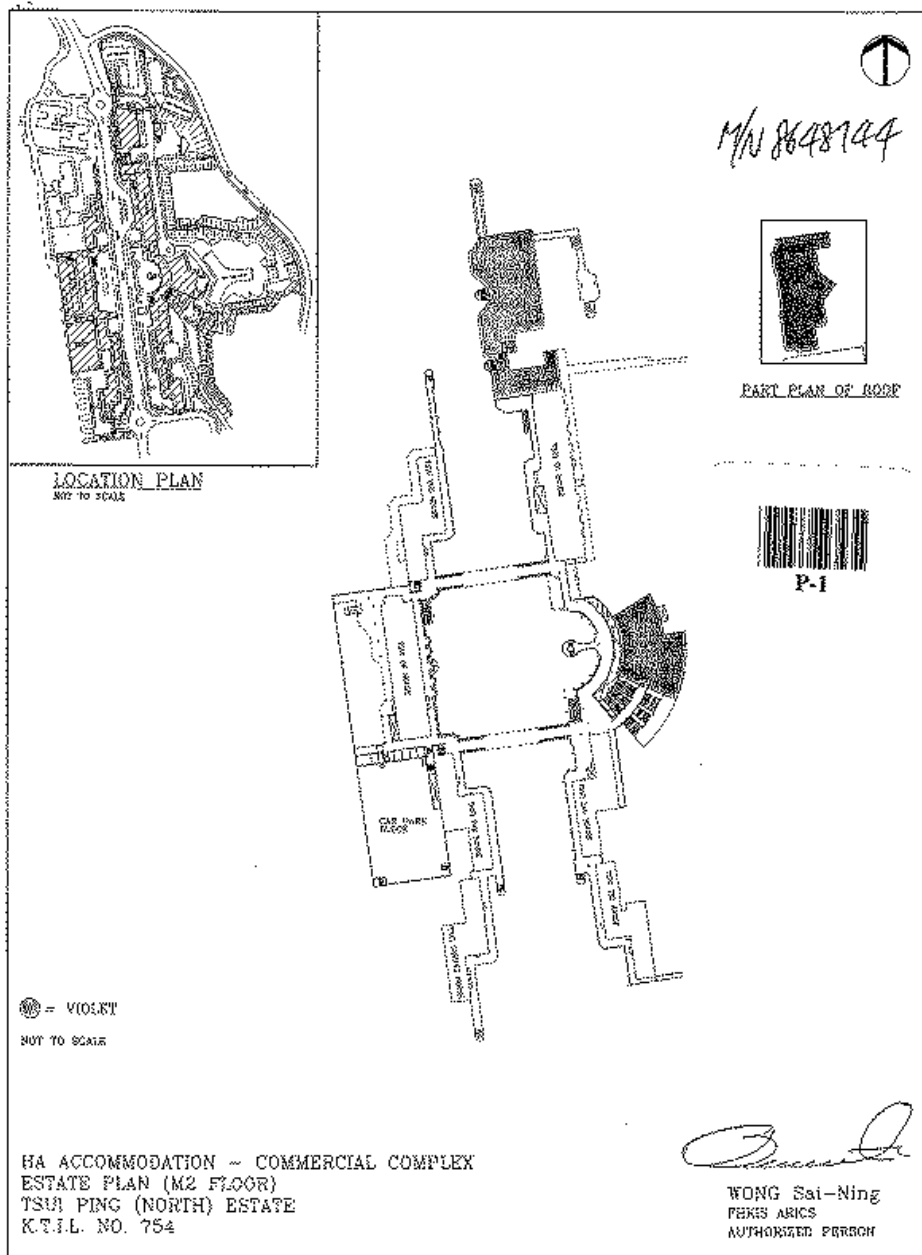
Layout Plan of HA Accommodation – Commercial Complex M2 Floor
